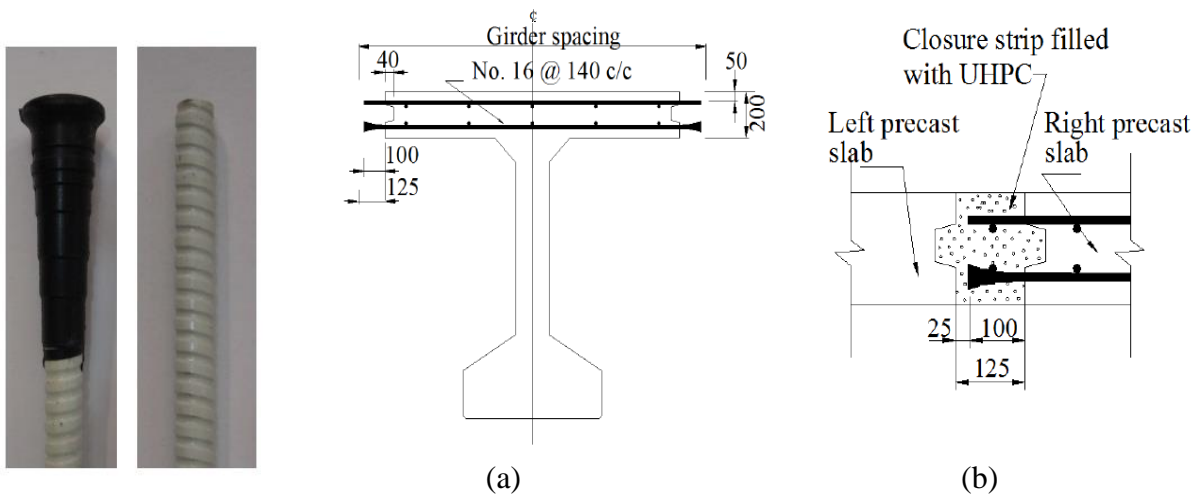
Views of GFRP bars Fig. 3 Schematic diagrams of: (a) DBT-girder and GFRP-bars; (b) Proposed closure strip
